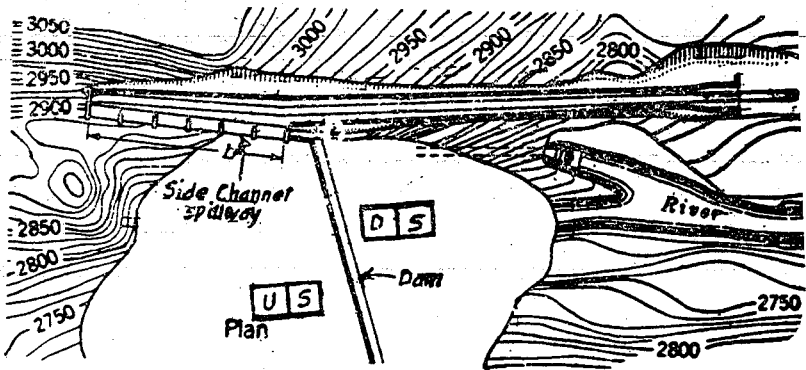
(b) Layout plan of a Side Channel Spillway.
